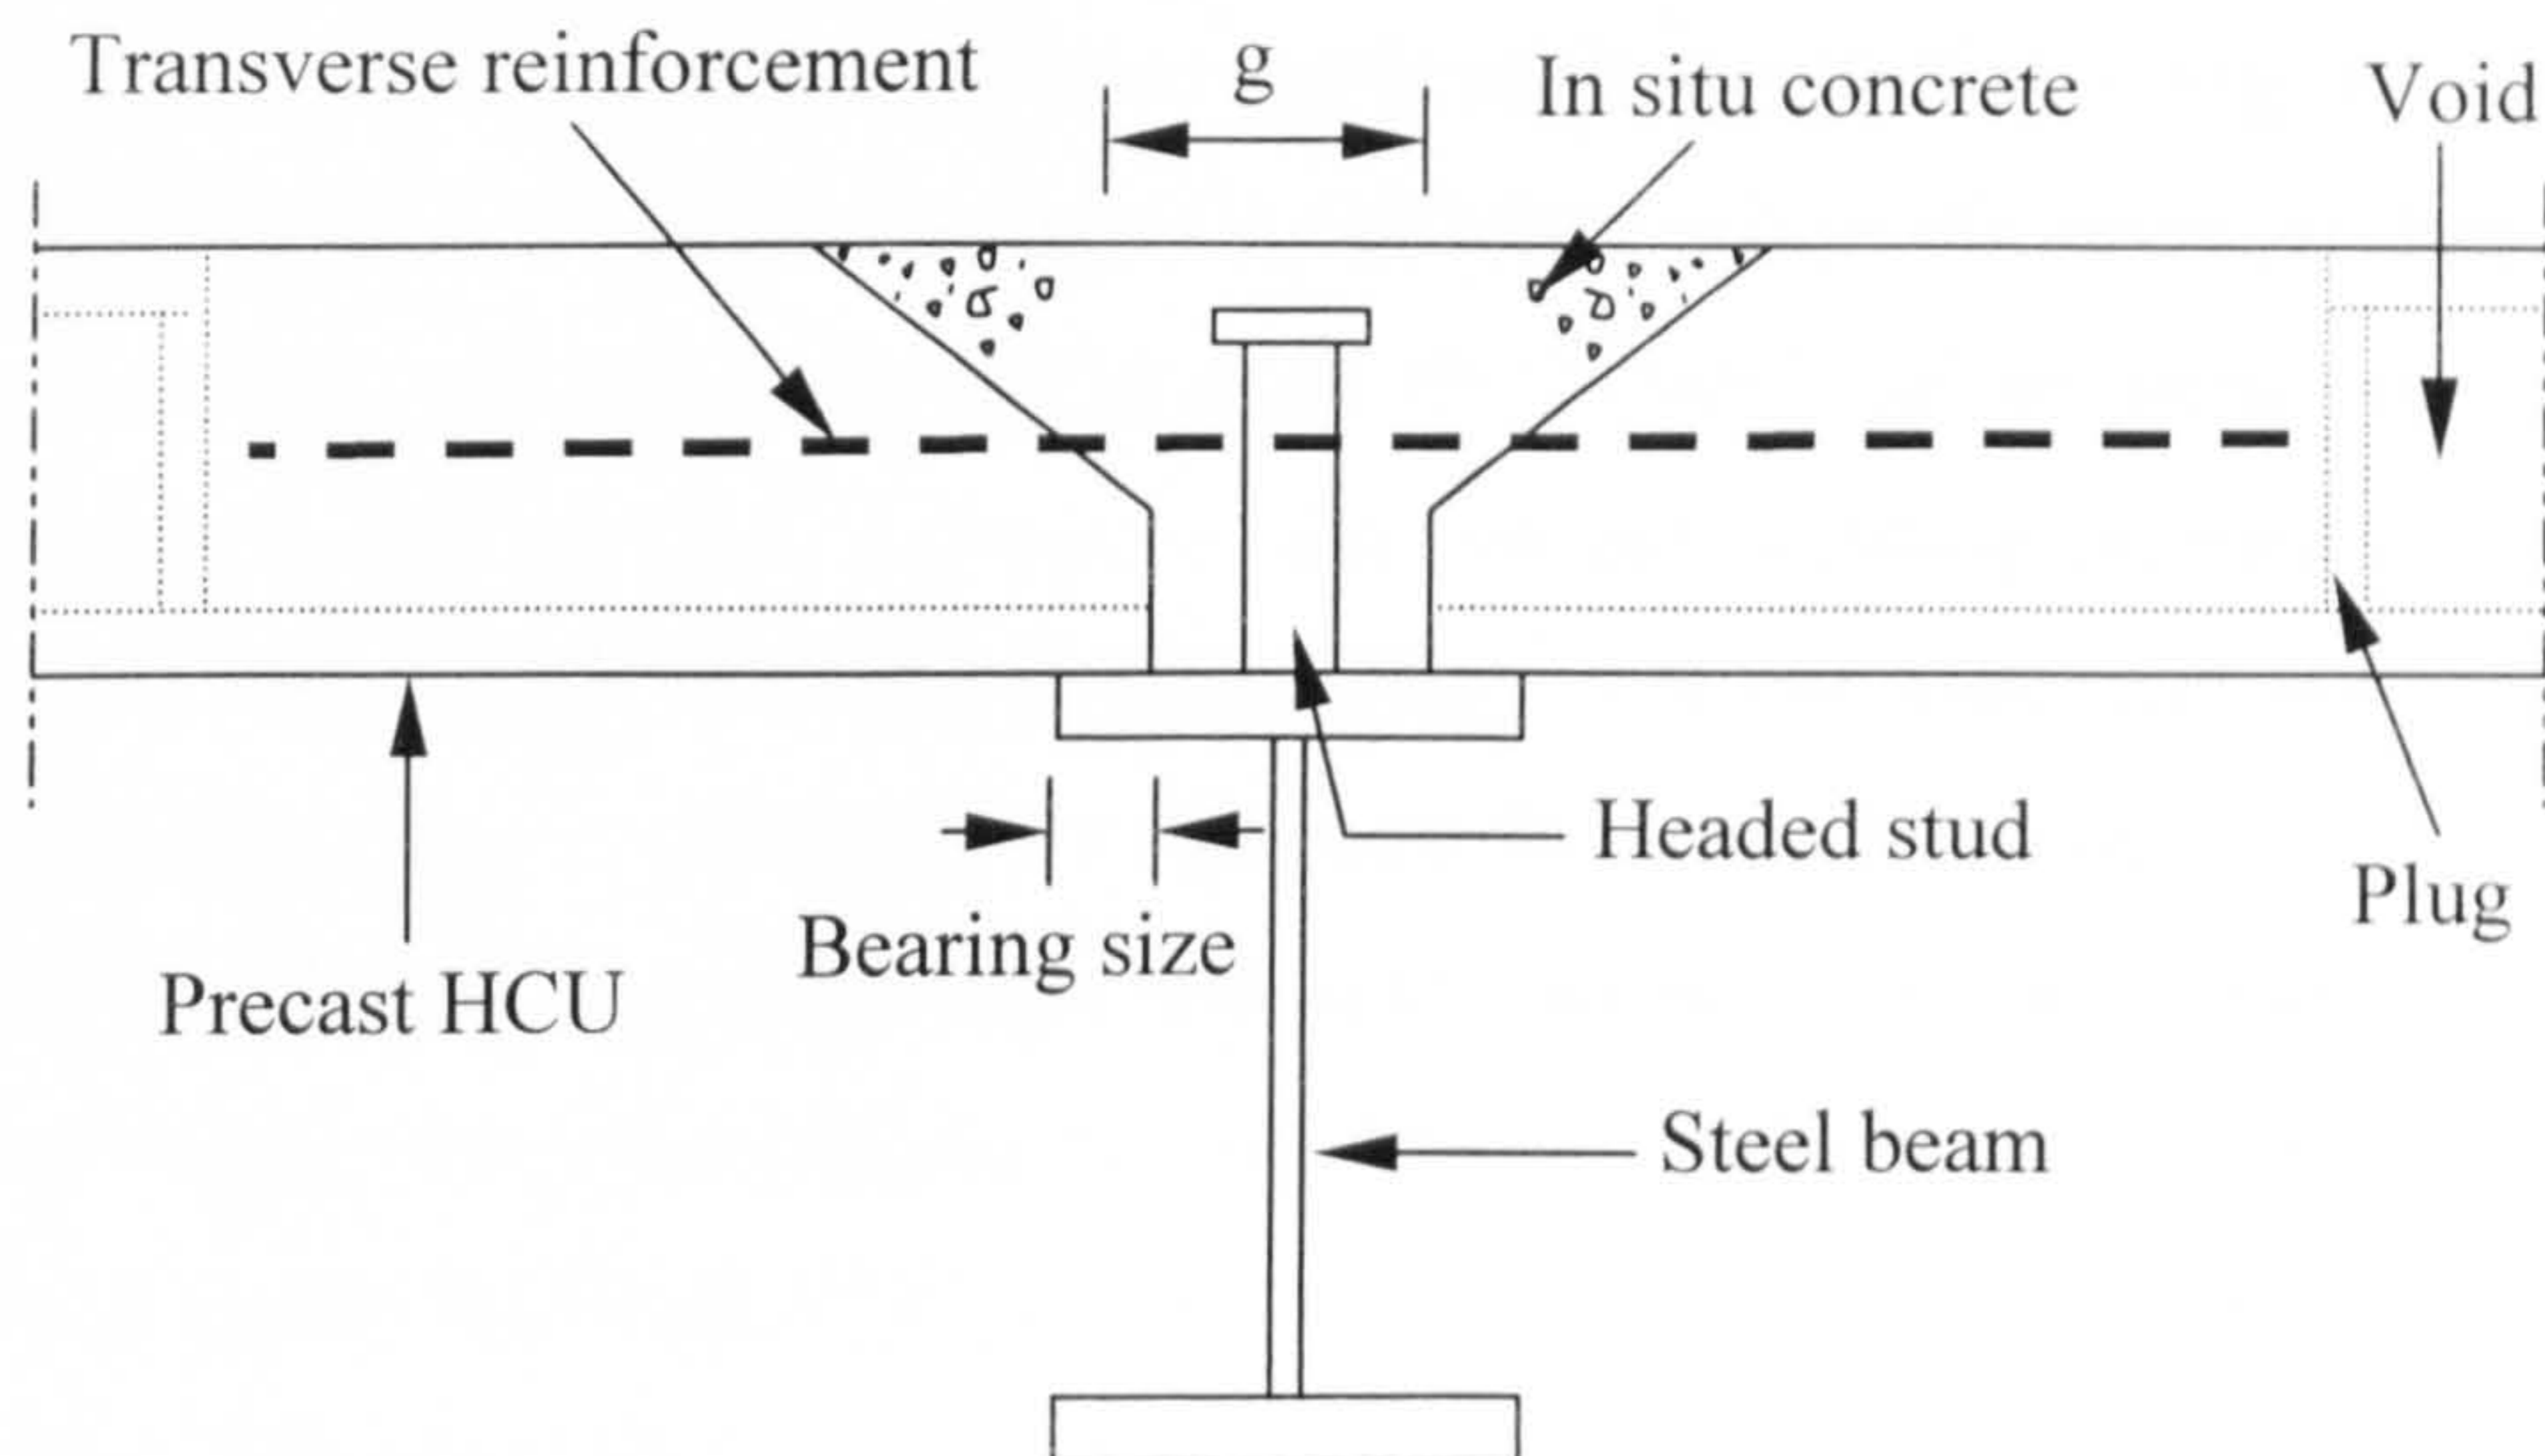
Details of the precast-in-situ joint of composite beam with tapered end HCU
